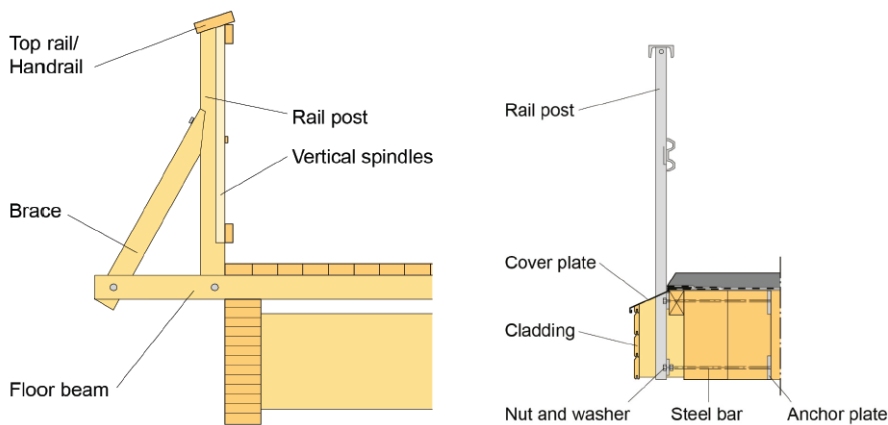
Cross section of two bridge types. Left: Wooden railing on pedestrian bridge. Right: Steel railing on road bridge.
